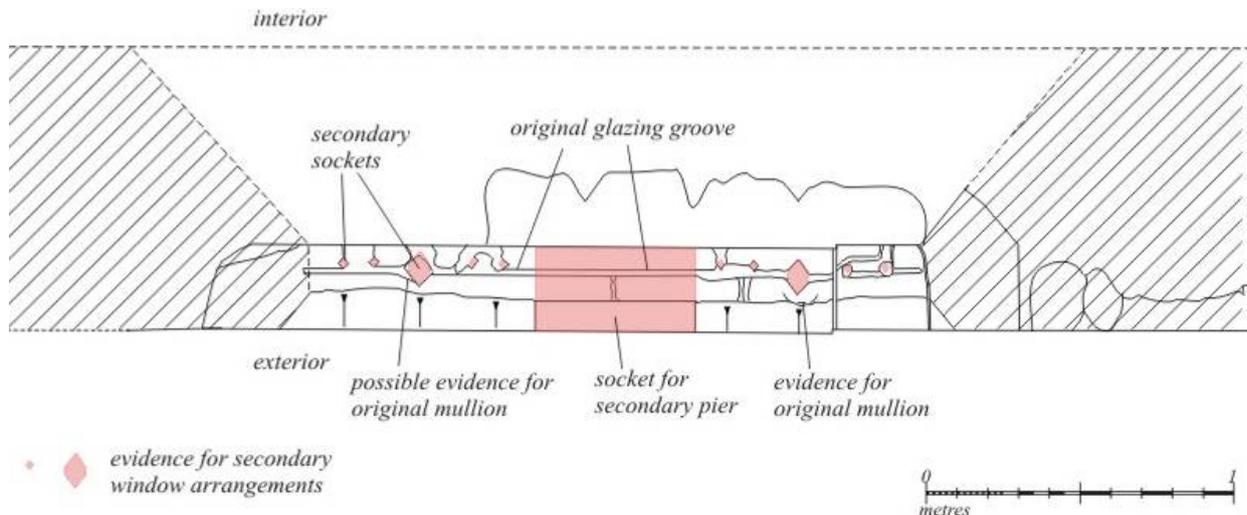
plan of window sill stone showing evidence for secondary window arrangement
